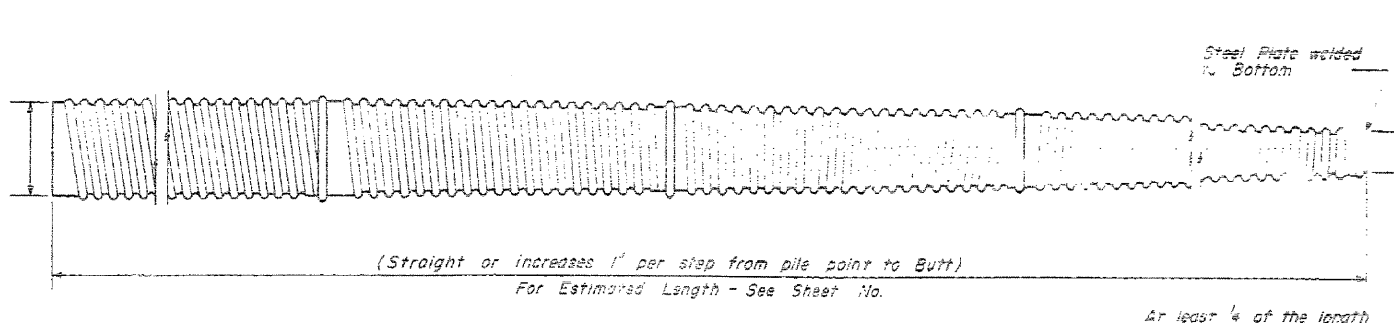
DETAIL OF CYLINDRICAL STEEL SHELL FOR CAST IN PLACE CONCRETE PILES
